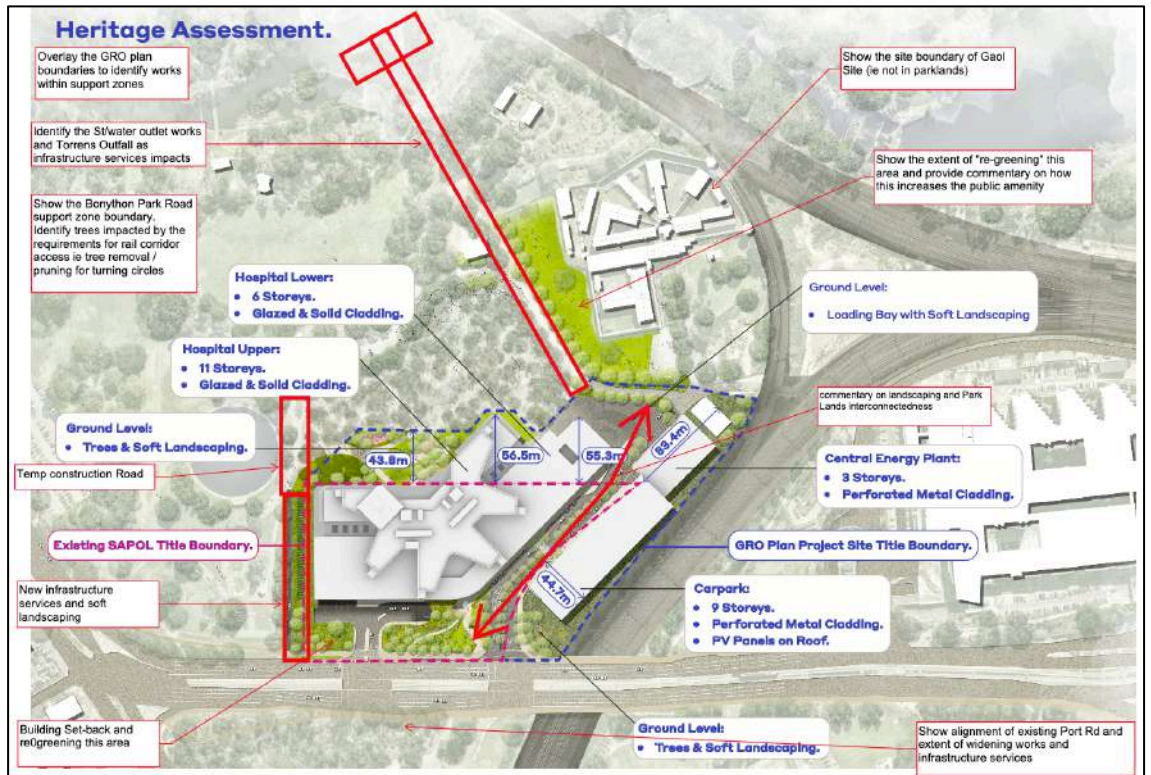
Annotated site plan of proposed development [Source: new WCH Project]
